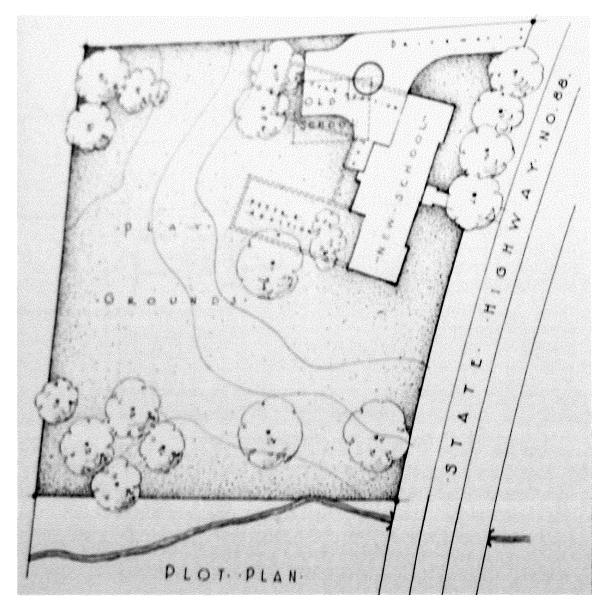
Original site plan of the Somerset School, showing footprint of 1899 "old school," 1936 "new school," and locations of potential future additions (off the rear of the "new school").<sup>257</sup>
